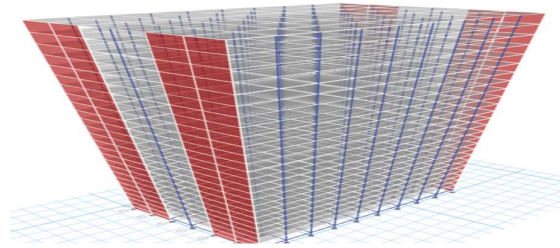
3D view of bare frame model having shear wall along Y-direction
